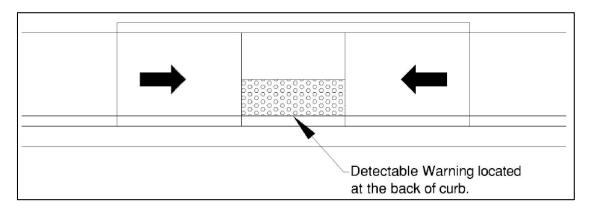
B - Detectable Warning Surface Placement (Parallel Curb Ramps)
